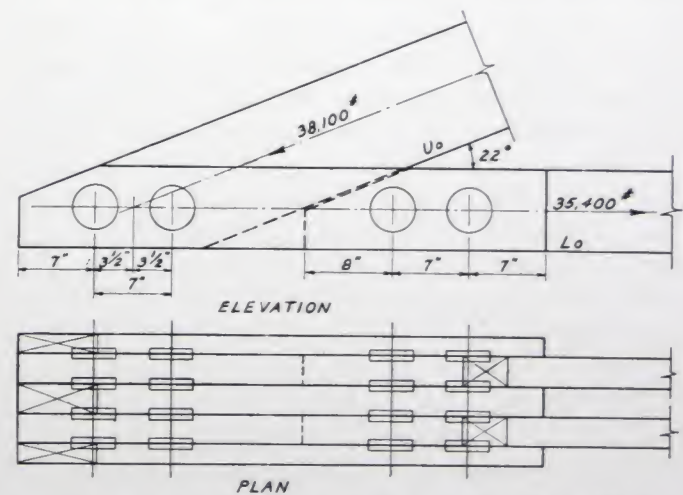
Heel Joint of Fink Truss with Top Chord Members Extending to Support
